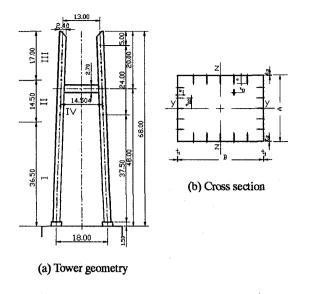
Steel tower of Iwamizawa cable-stayed bridge
